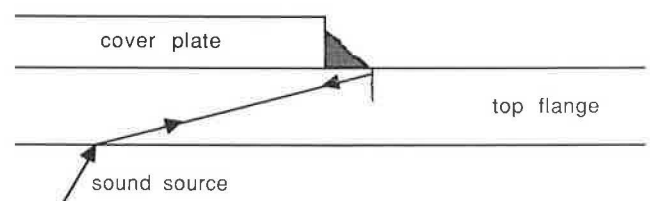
Sound reflection from fatigue crack at weld toe.
